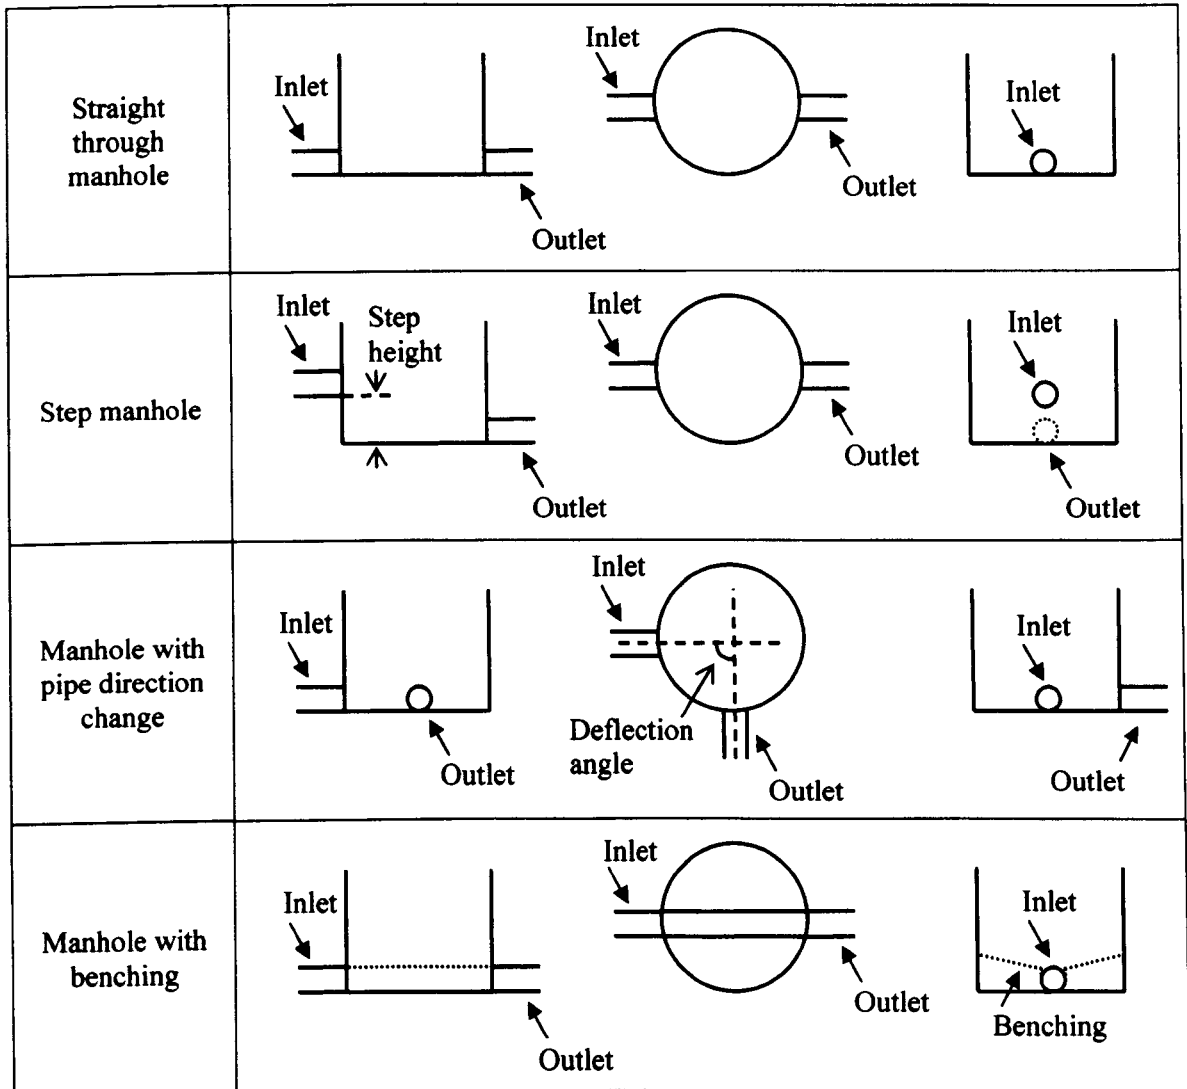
Schematic diagrams of manhole with different manhole configurations (Left – Side elevation; Middle – Top view; Right – Front elevation)
